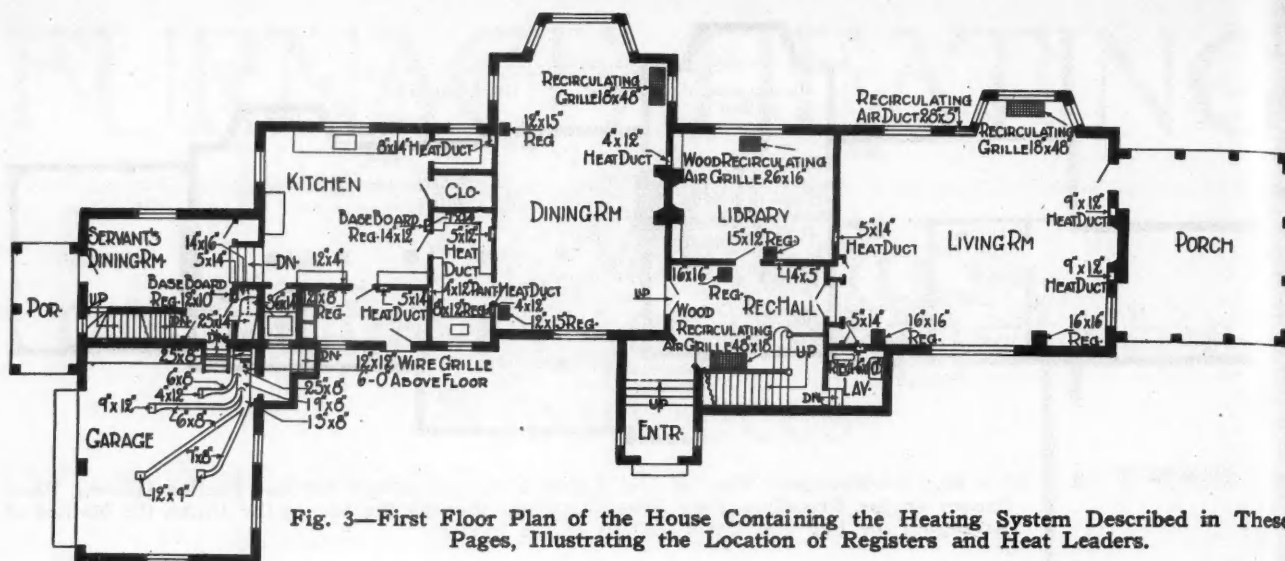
First Floor Plan of the House Containing the Heating System Described in These Pages, Illustrating the Location of Registers and Heat Leaders.
